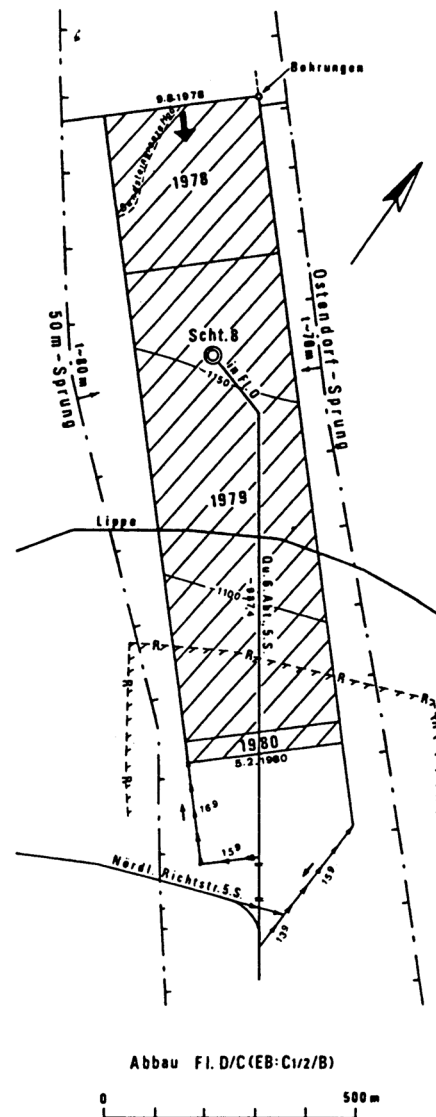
Plan of workings beneath Auguste Victoria no.8 shaft (longitudinal section)
